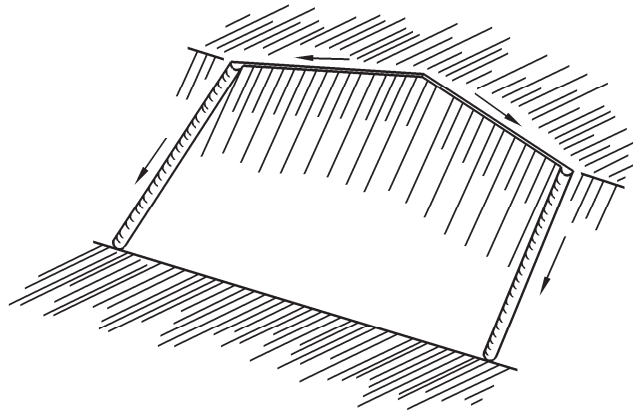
Trenched drains above the soil nail structure guided to the sides of the slope
